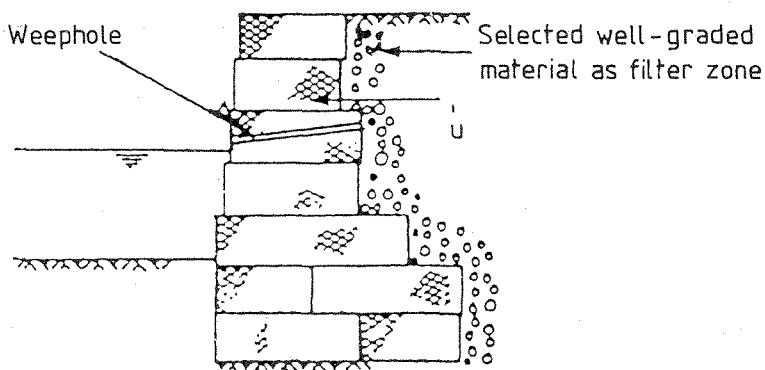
PRECAST CONCRETE BLOCK WALL
